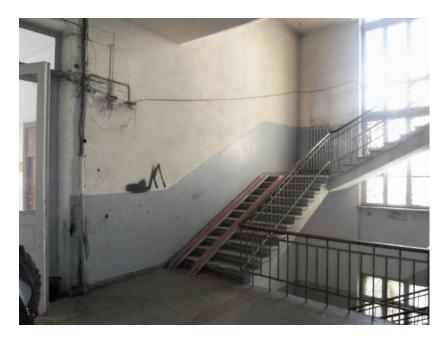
Foyer stairwell in Chachavadze building. Note the electrical cabling is messy. The stairs have wheelchair ramps.
